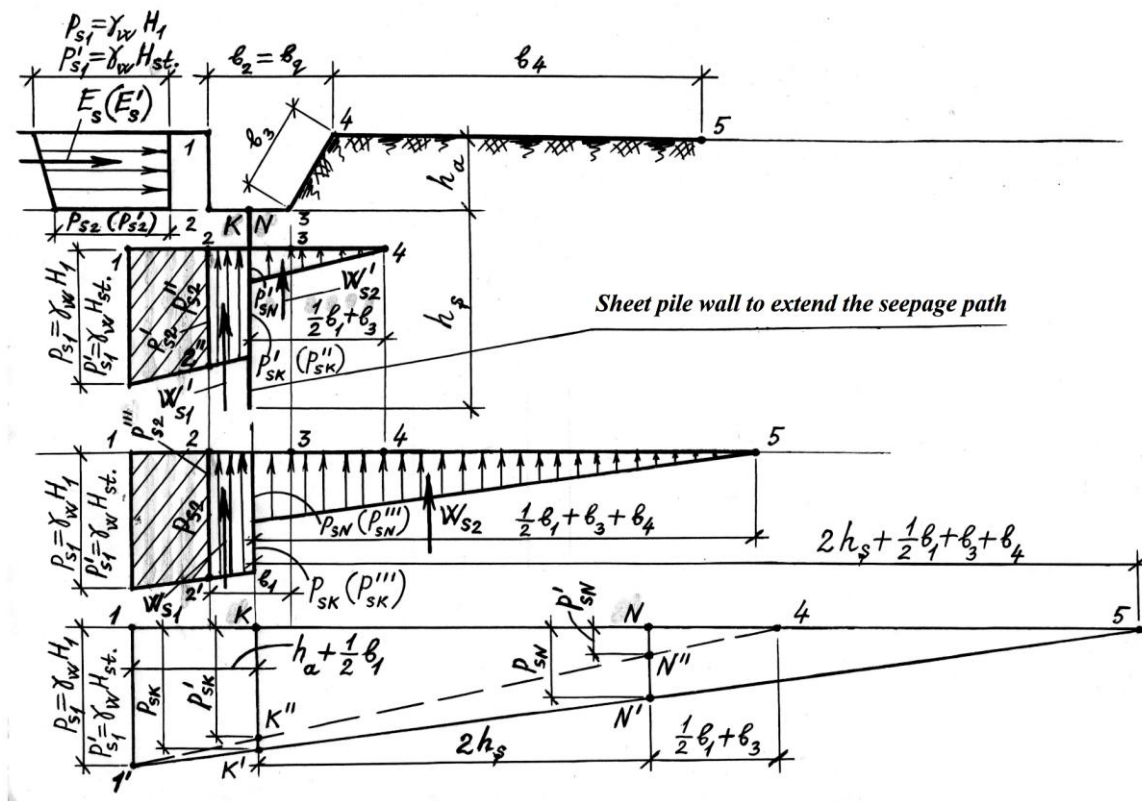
Leakage calculation scheme for buttress dam foundation with sheet pile foundation.
